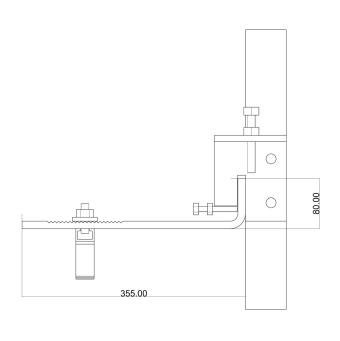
Halfen Bracket Perspective View. Source: Halfen, Author
